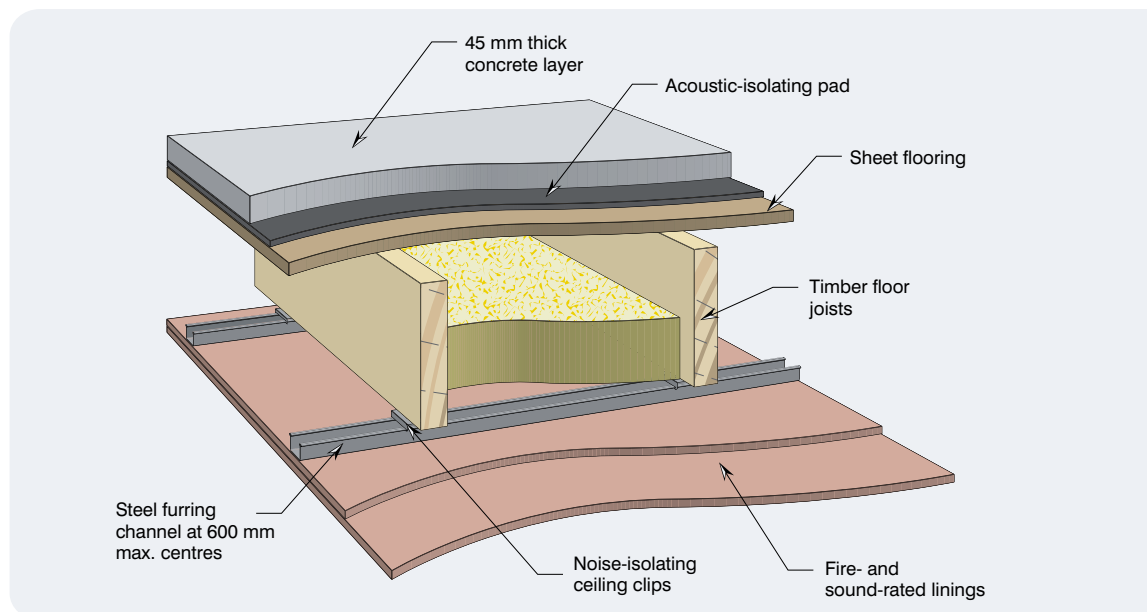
Adding mass to floor system through the use of concrete topping.
